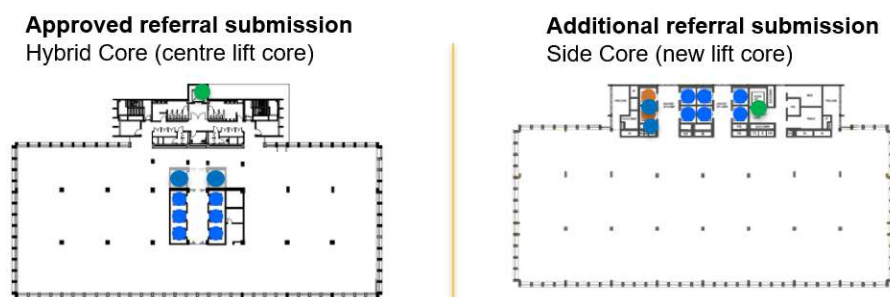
Two plans showing the changes proposed between the approved Hybrid Core (referred to as Option B) arrangement (LHS) and the proposed Side Core layout (RHS). (source: Architectus)
